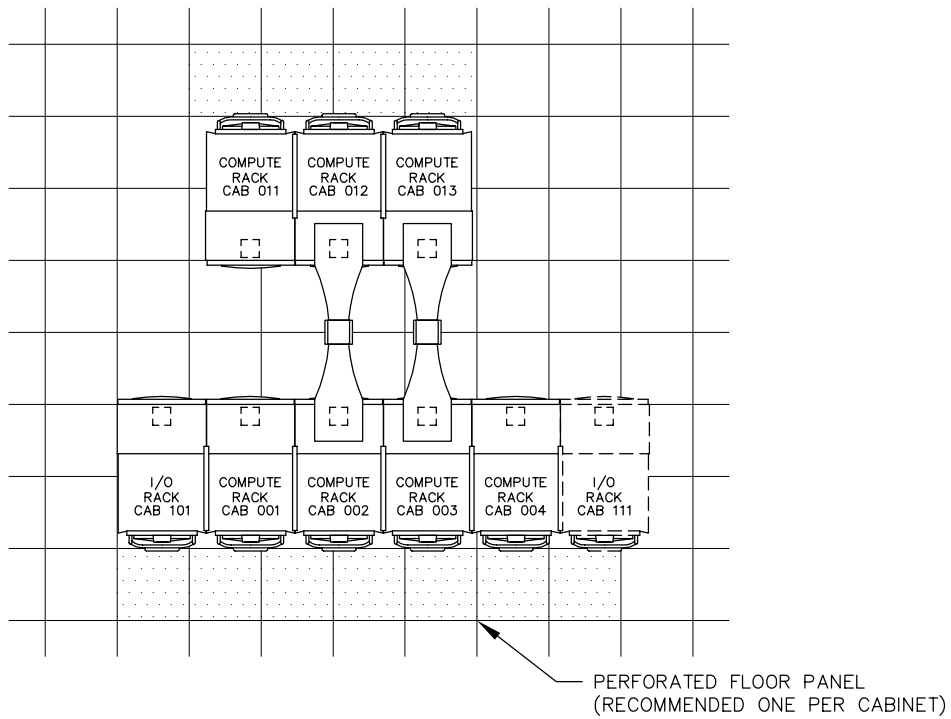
Standard Floor Layouts Placed on 24 in. x 24 in. Floor Panels
